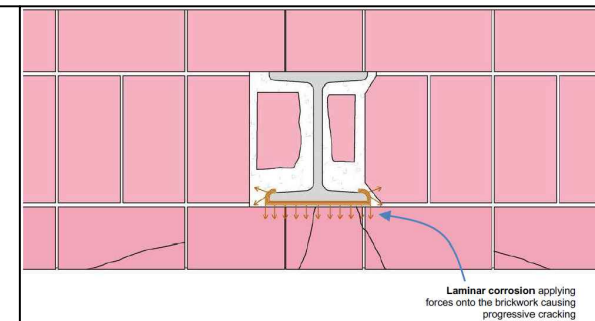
DRAWING SHOWING LAMINAR CORROSION OF STRUCTURAL STEELS AS A DETERIORATION MECHANISM CAUSING THE FRACTURE OF ADJACENT MASONRY UNITS (INGRAM CONSULTANCY FACADE CONDITION REPORT, 2022).
